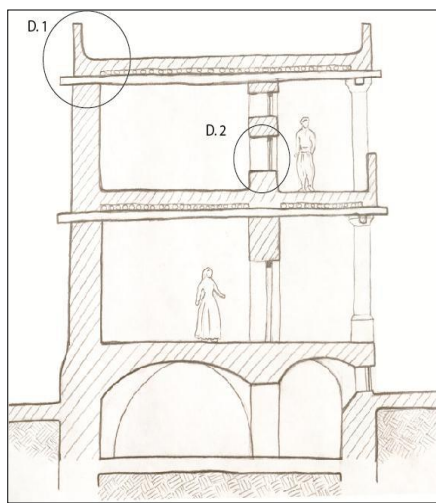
Cross-section of a typical vernacular house that uses wooden beams as construction technique for the ceiling (Abdulkareem, 2012)
